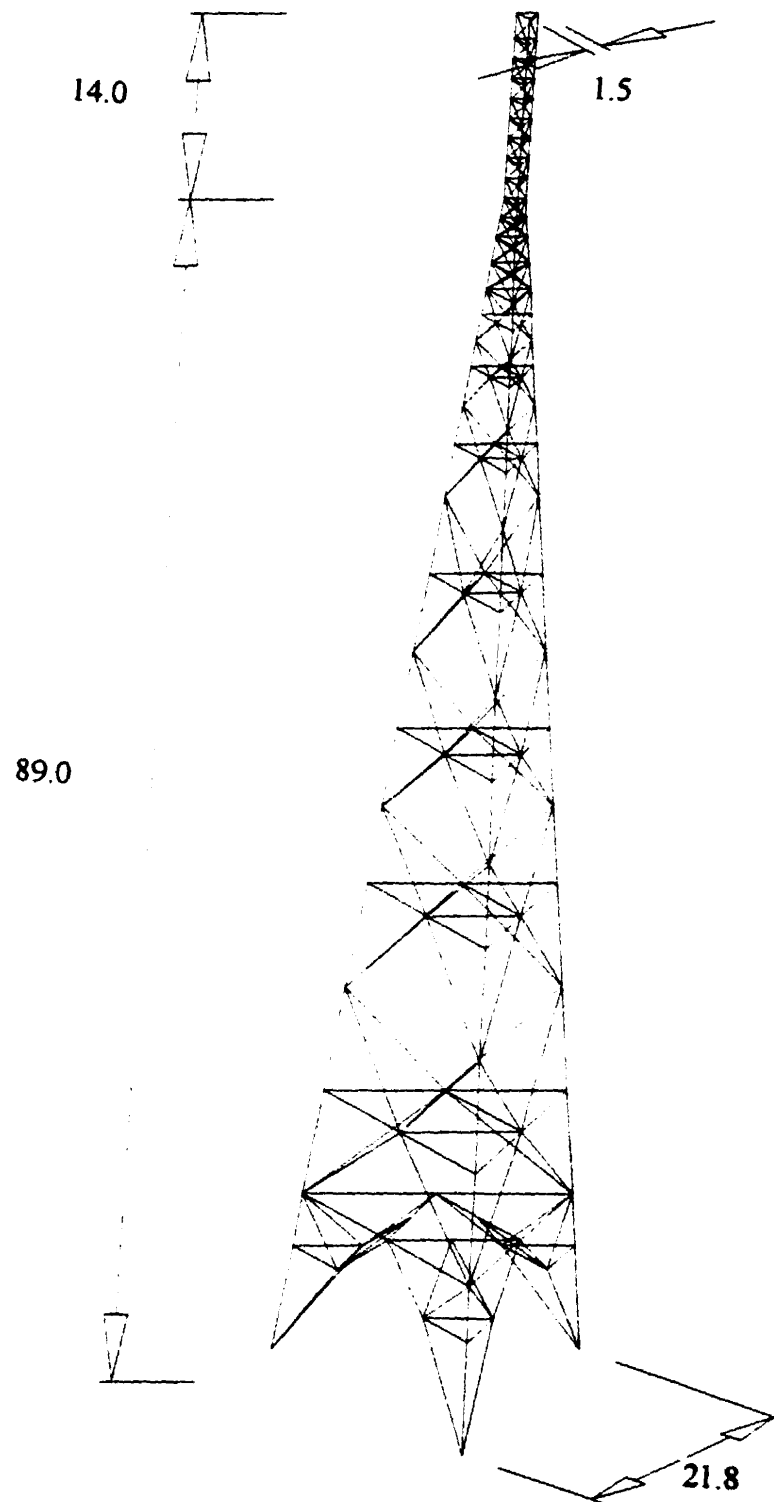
Layout of tower TC4 (dimensions are in m)
